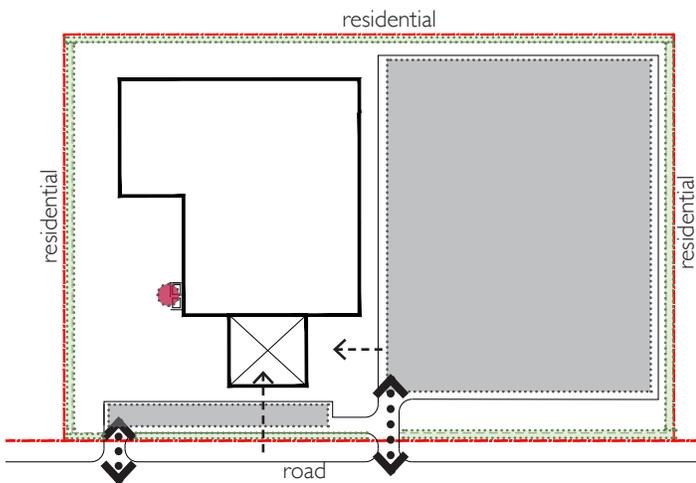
Industrial site internal lot layout with limited surface parking between the road and the building
